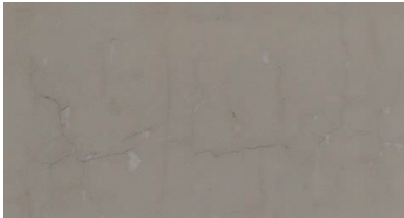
An ortho of a wall (pixel size: 3.5mm)
